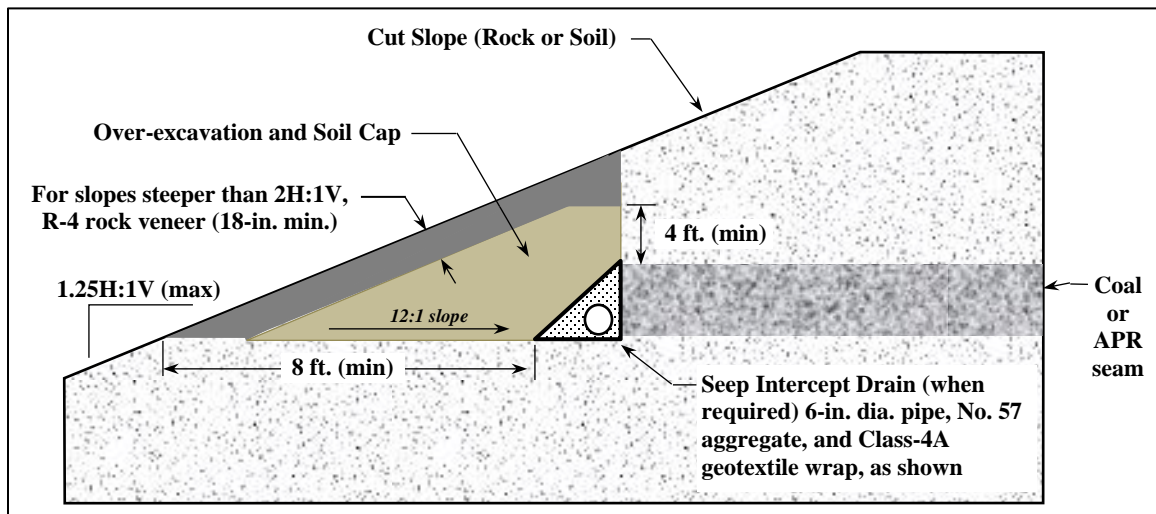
Typical Section: Minimum Requirements Rock Cut with Seam Outcrop Treatment 1.25H:1V or flatter (Condition D)
